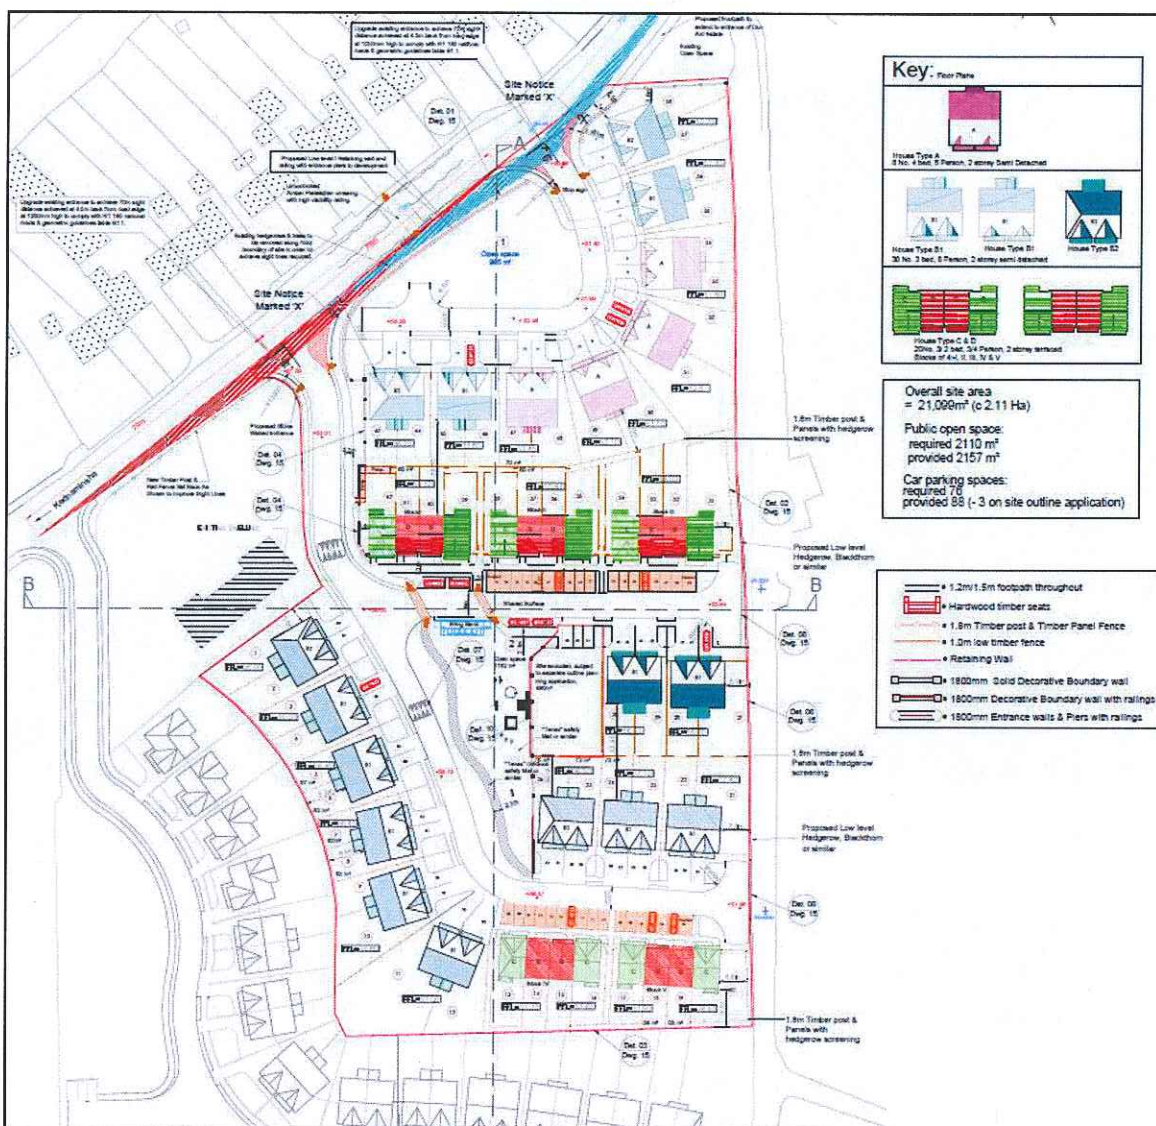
Site layout approved under permission 06/2060 which provided for 58no. dwellings
